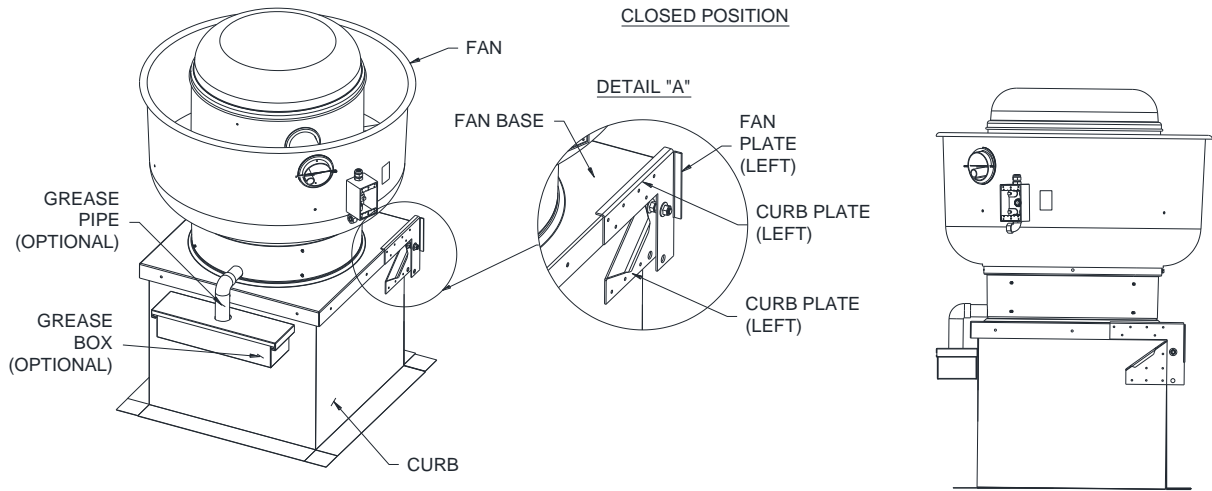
Centrifugal Up-blast Hinge Kit Installation Details
